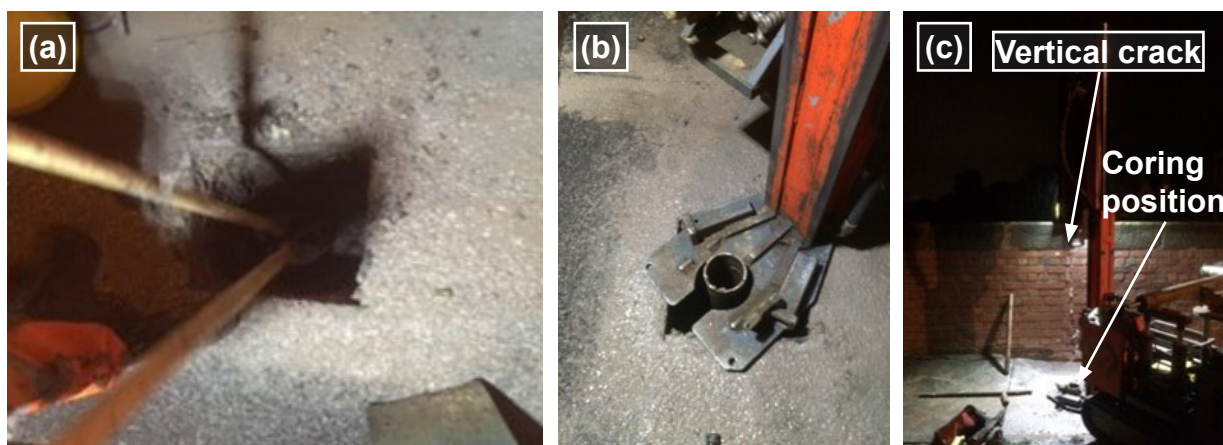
Photographs from the day of the incident showing; (a) 300 x 300 mm trial hole being dug; (b) coring machine set over trial hole; and (c) proximity of coring to vertical crack in parapet (images courtesy of CML)
